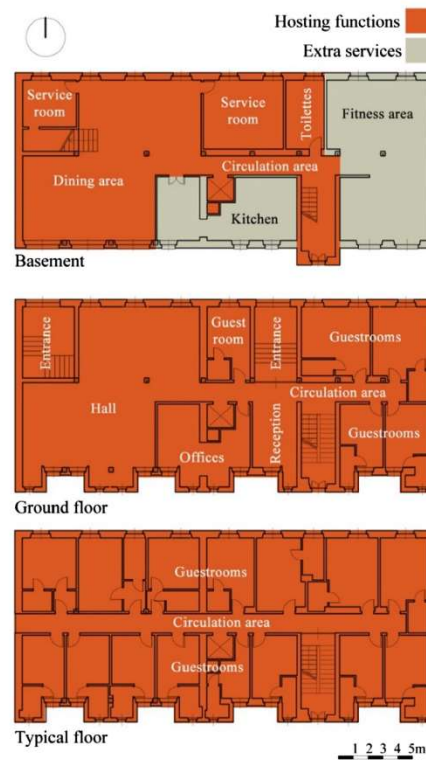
Reference Hotel's internal layout for basement, ground floor and typical floor.
